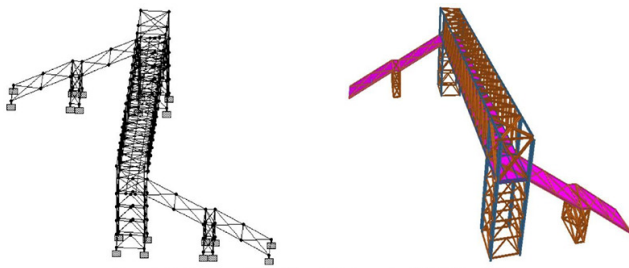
Footbridge modeling side and 3D view under STAAD.Pro [33].
